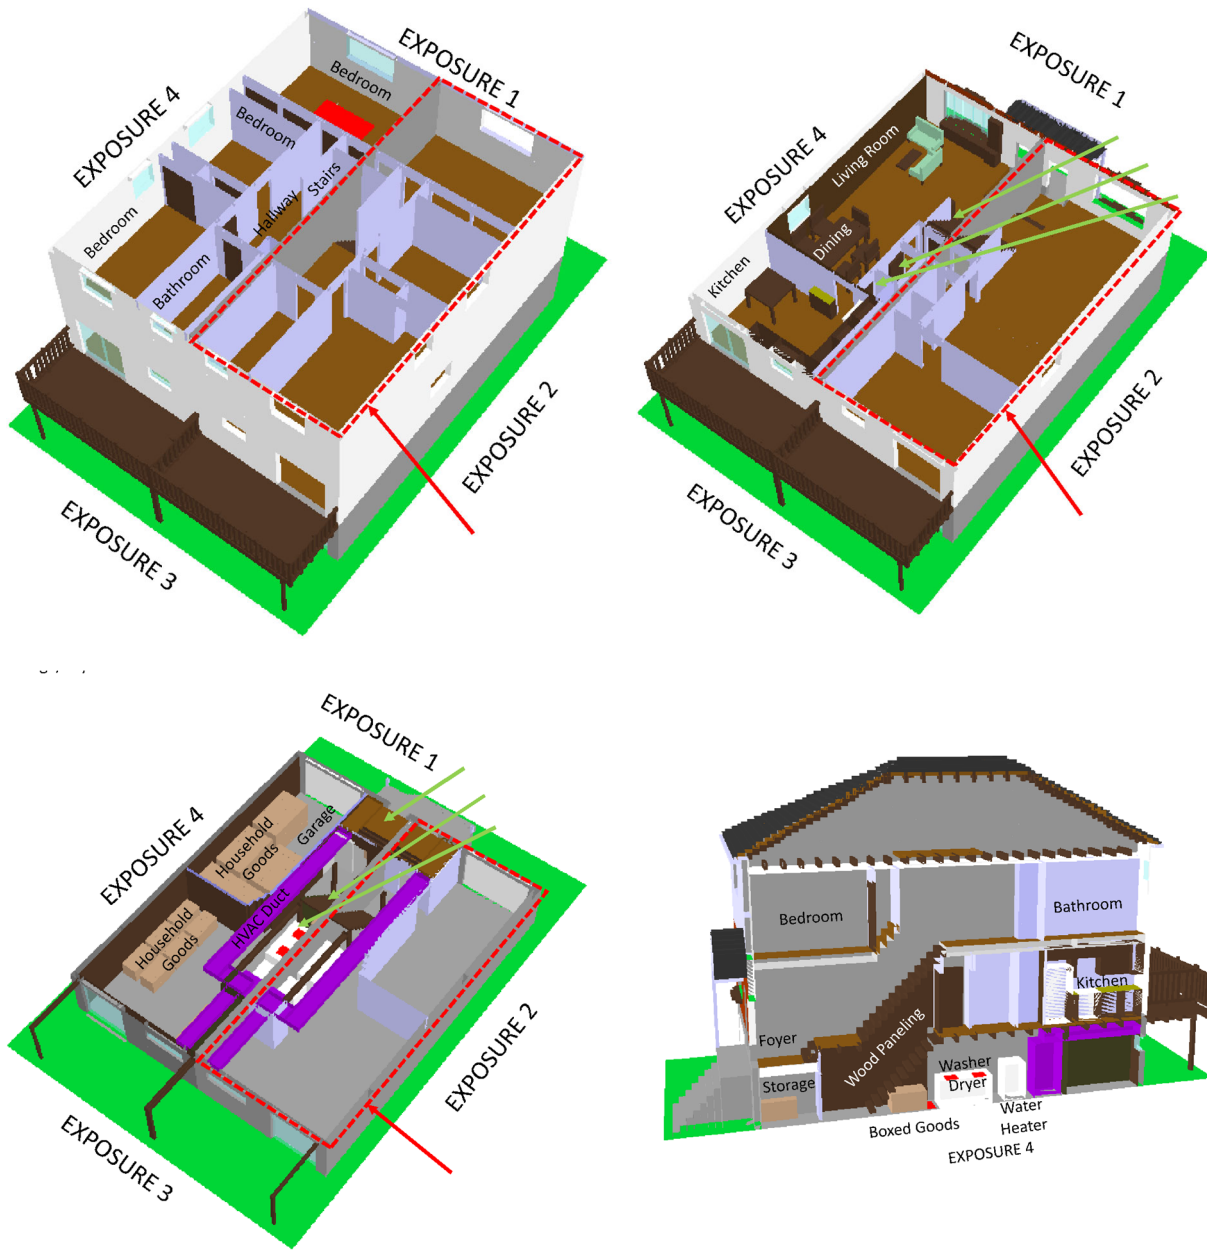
Interior isometric views of Fire Building and Exposure #4 Building. Top Left – second floor, Top Right first floor. Bottom right – basement. Bottom left – Exposure #4 Building clipped to edge of staircase.
